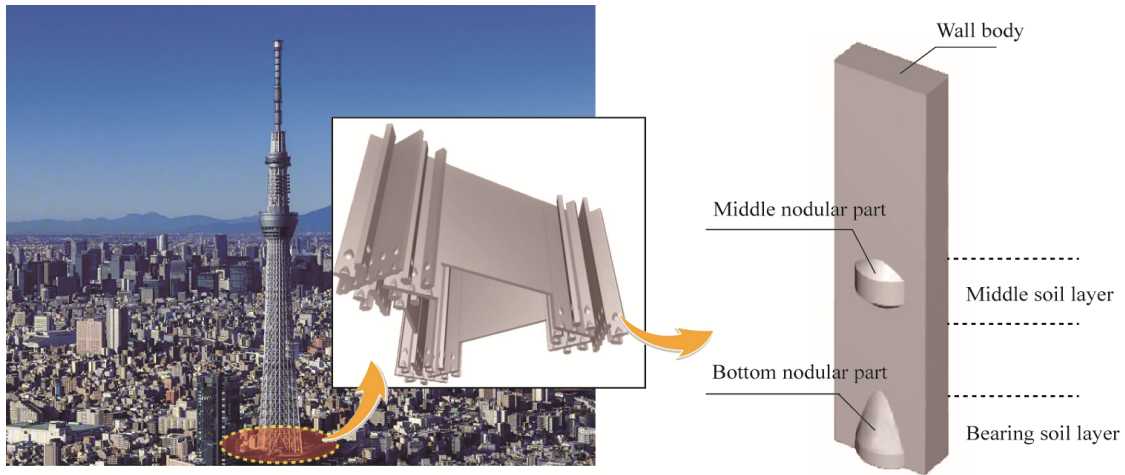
Application case and structural scheme of nodular diaphragm walls (Yokoyama *et al.* 2009)
